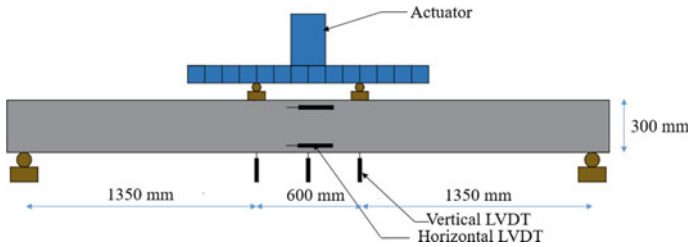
Test setup for RC and FRP strengthened beams under flexural loading
